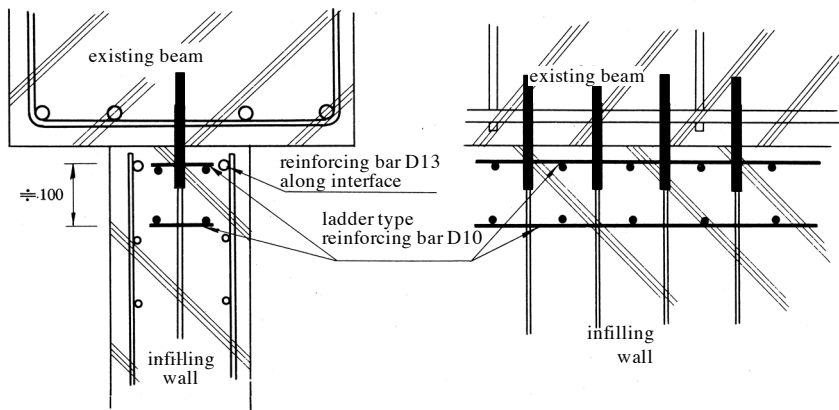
Strengthening against splitting with ladder type reinforcing bars
